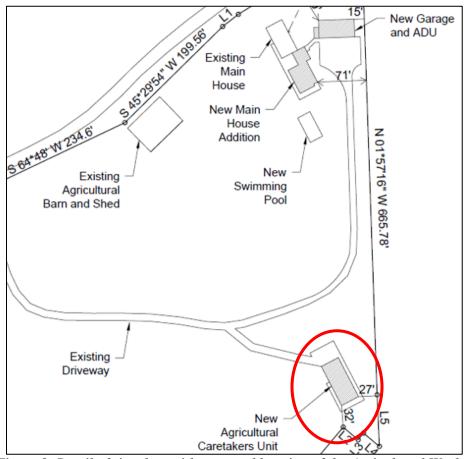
Detail of site plan, with proposed location of the Agricultural Worker ADU indicated in red.
